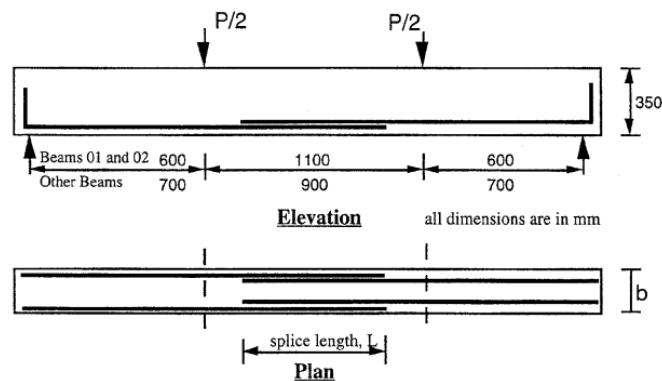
Beam splice specimens tested by Esfahani and Rangan [55].
